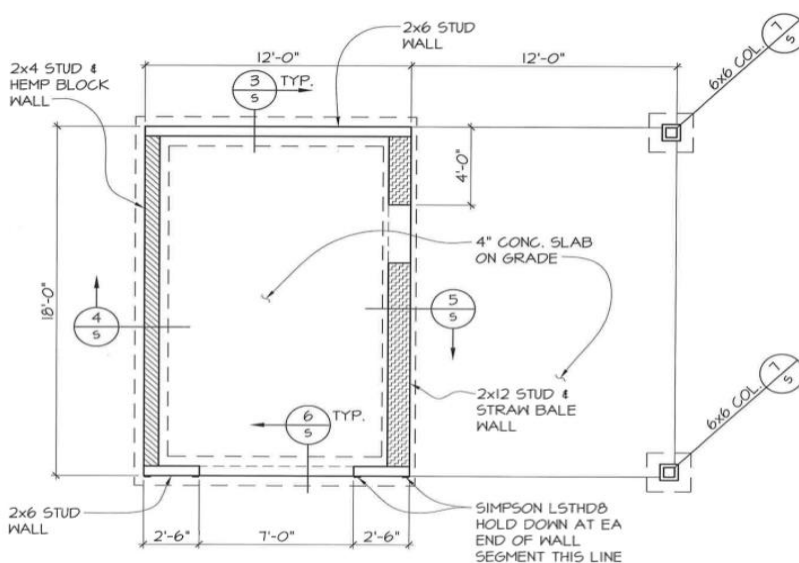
SHED plan provided by Brett Maddox of PCS Structural Solutions
